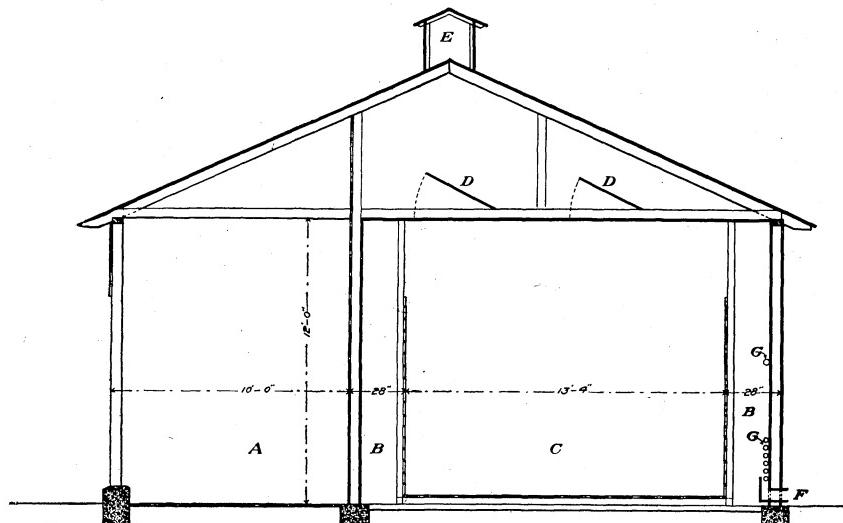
Cross section of large storage house: A, driving shed; B, space between outer walls and potato bins; C, storage bins; D, ceiling ventilators; E, top ventilator; F, bottom ventilator; G, heater pipes.
